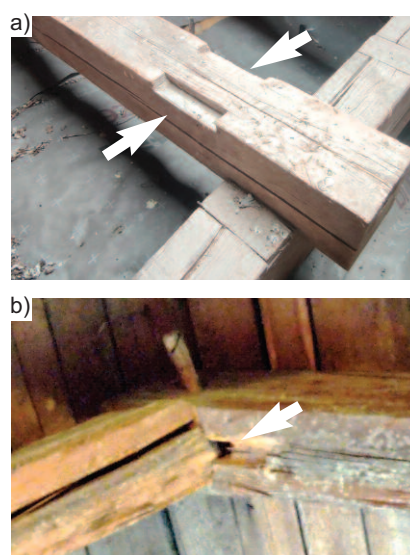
Incorrect connections: a) empty carpentry connections; b) loose carpentry connection in the roof ridge
